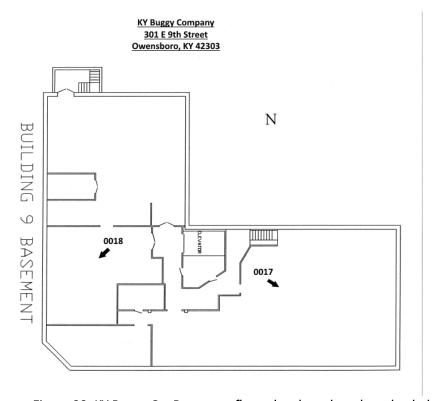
KY Buggy Co, Basement floor plan, keyed to photo log below.
